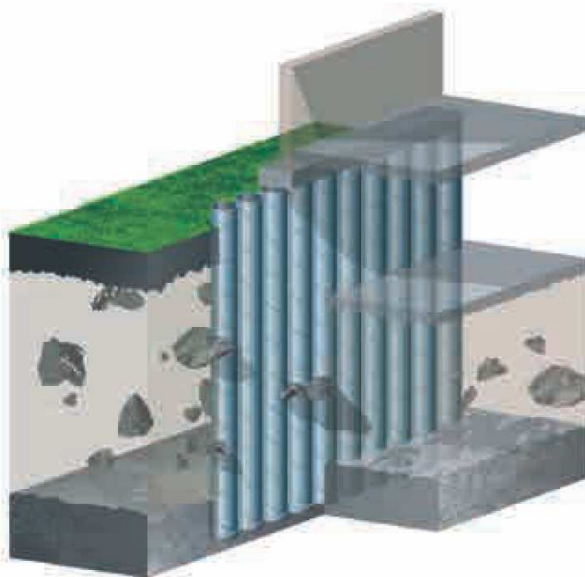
Building with a basement with an RD pile wall as a bearing basement wall [1]
